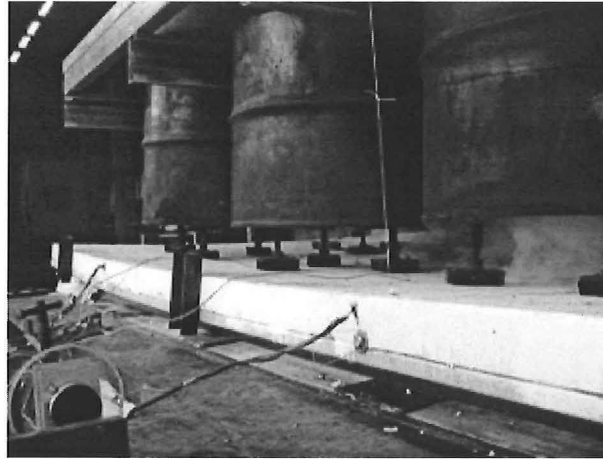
Steel angle welded to the supporting steel frame to clamp down the corners.
